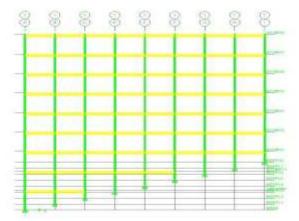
Elevation of step back building for eight storey model (150 slope)
